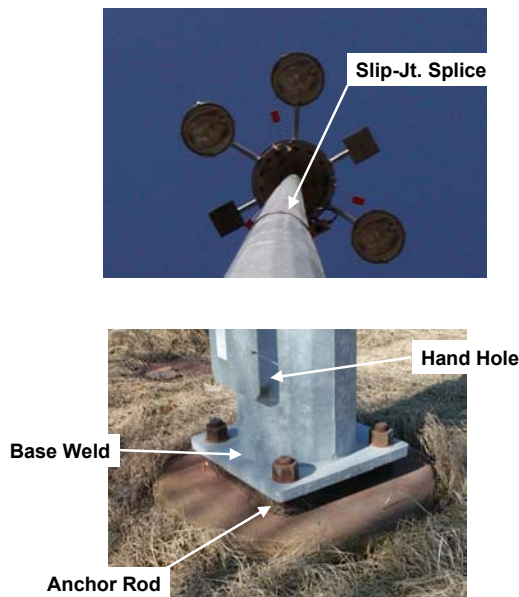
Typical Details Found in High-Mast Luminaire Support Structures.
